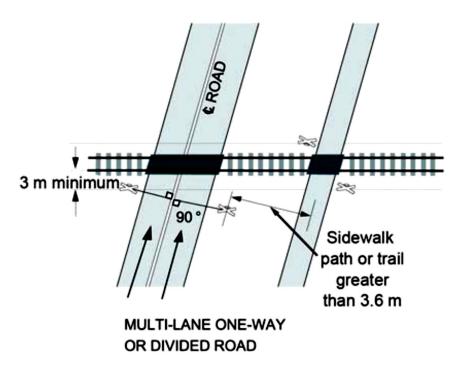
Figure SUB-PART E – 10 – Location of Railway Crossing Signs (Sidewalk, Path, Trail > 3.6 m)
